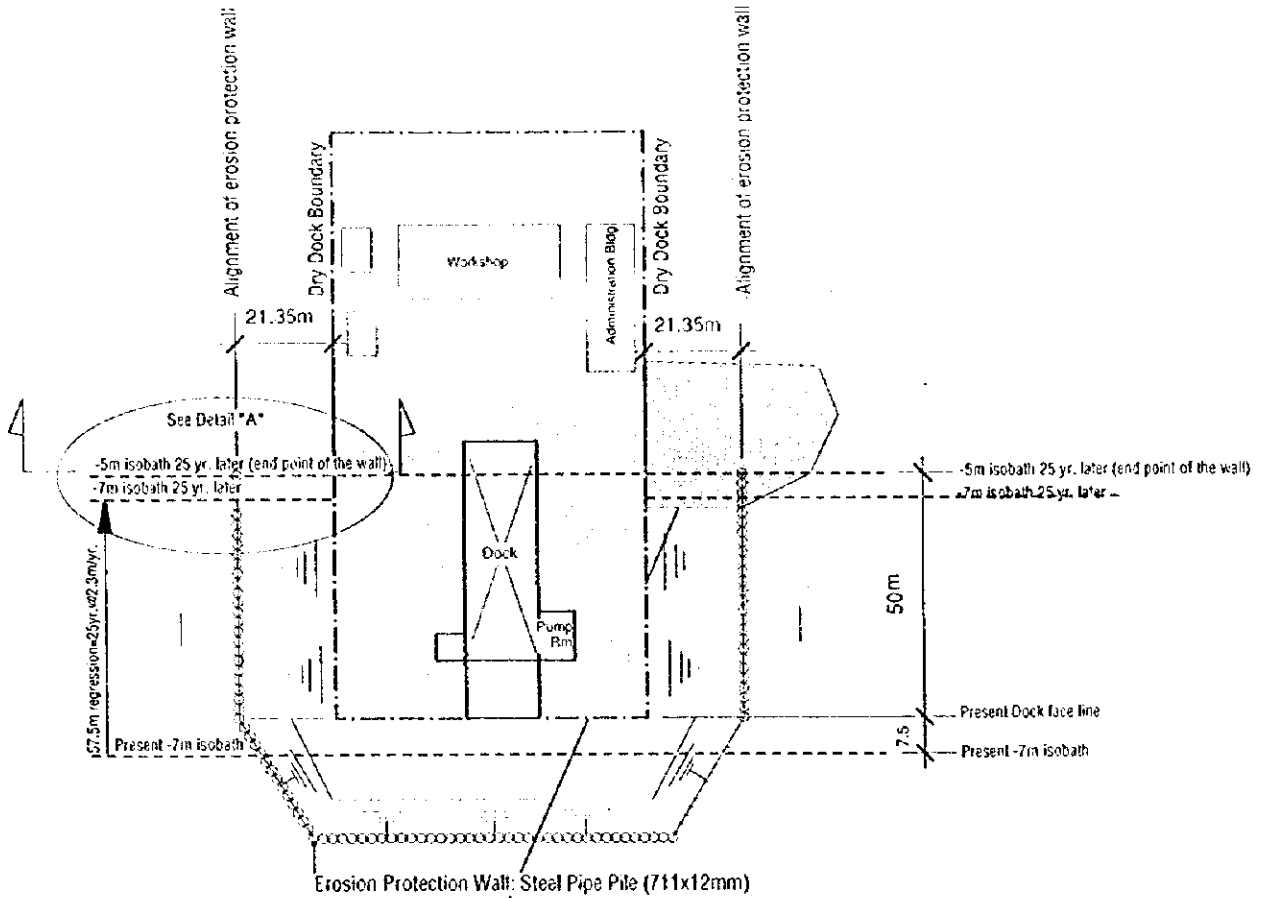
Projected Local Scouring Areas Due To Plan Facility
